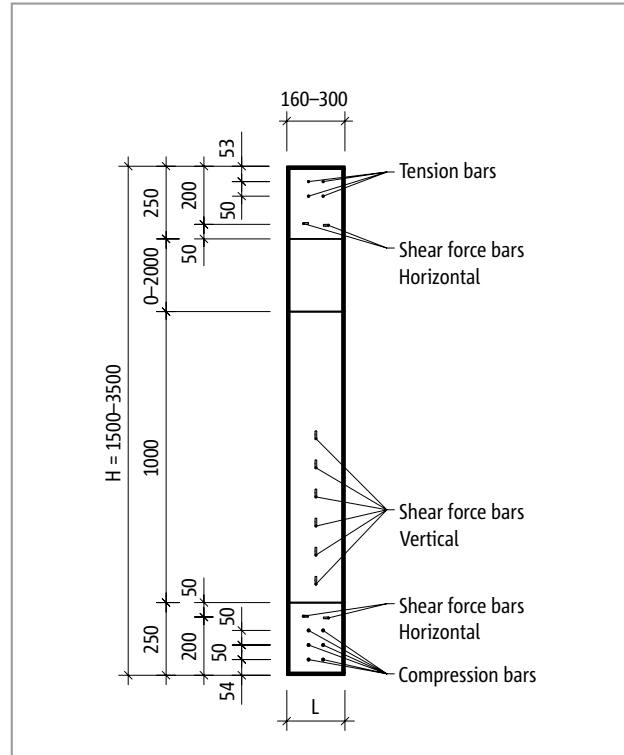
Schöck Isokorb® T type W-M1-R90: Product layout; perimeter fire protection boards
